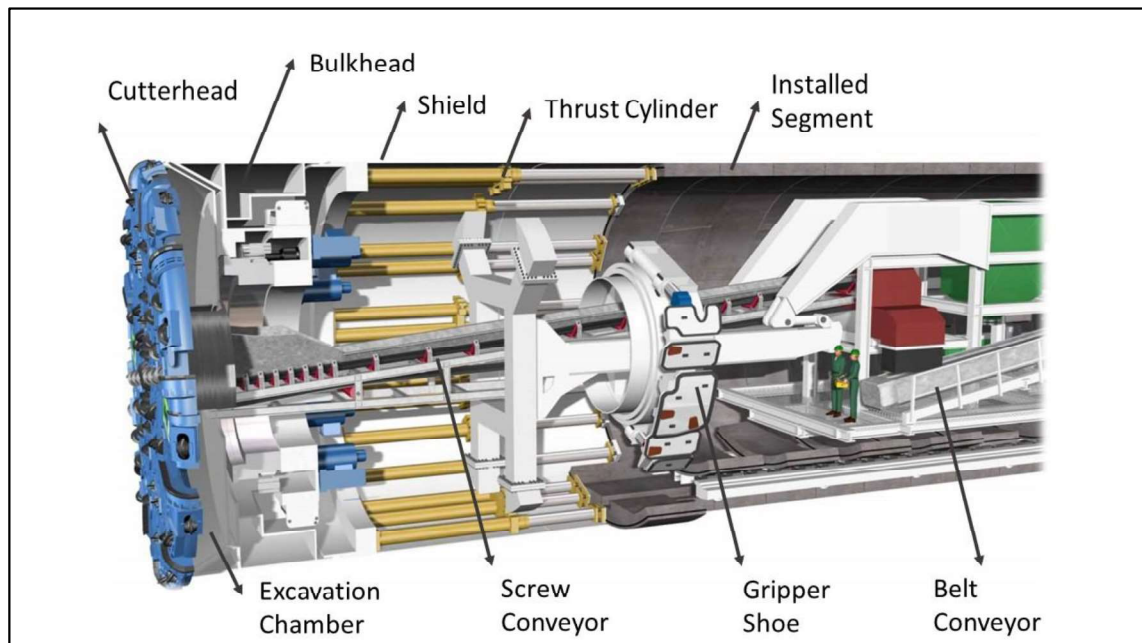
Tunnel boring machine elements (Obaid, 2001).
